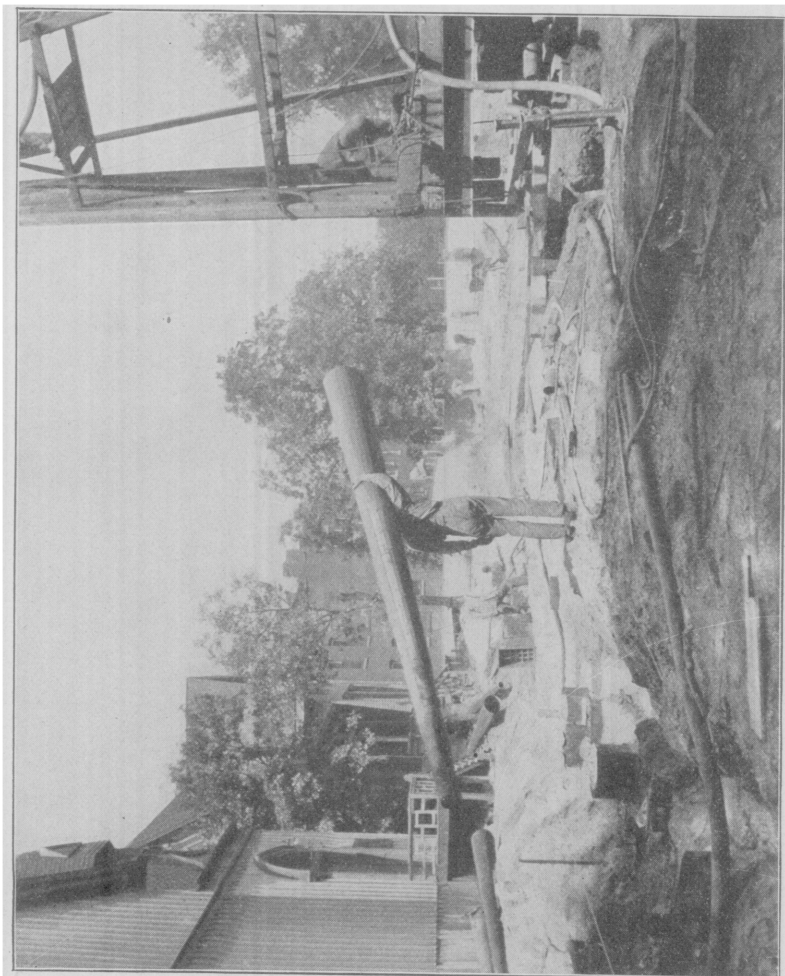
Shell for Raymond Concrete Pile, 20 Feet Long, Weighing 70 Pounds.
